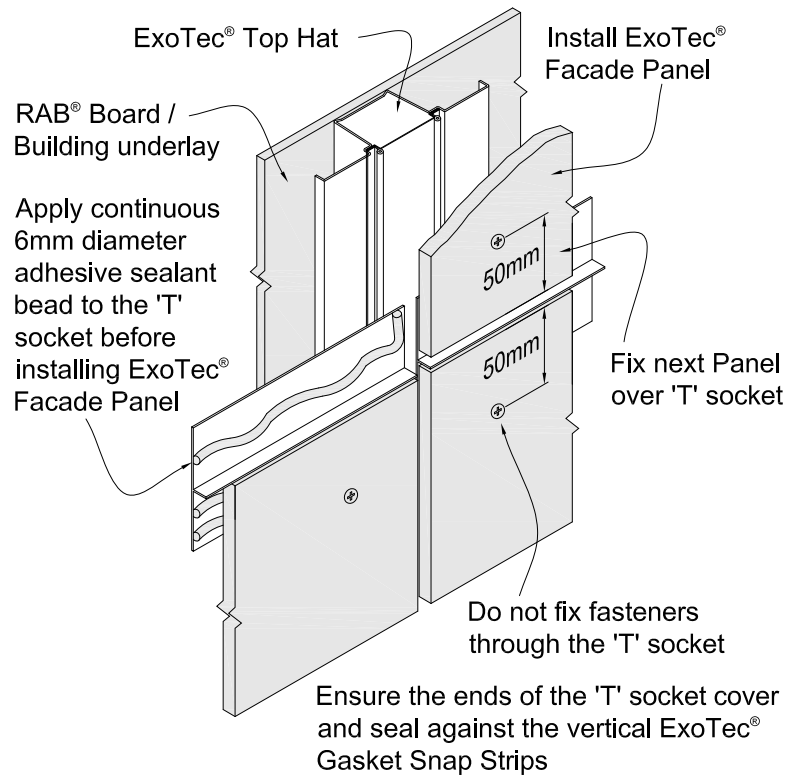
Sealing aluminium 'T' socket to ExoTec Top Hat section
